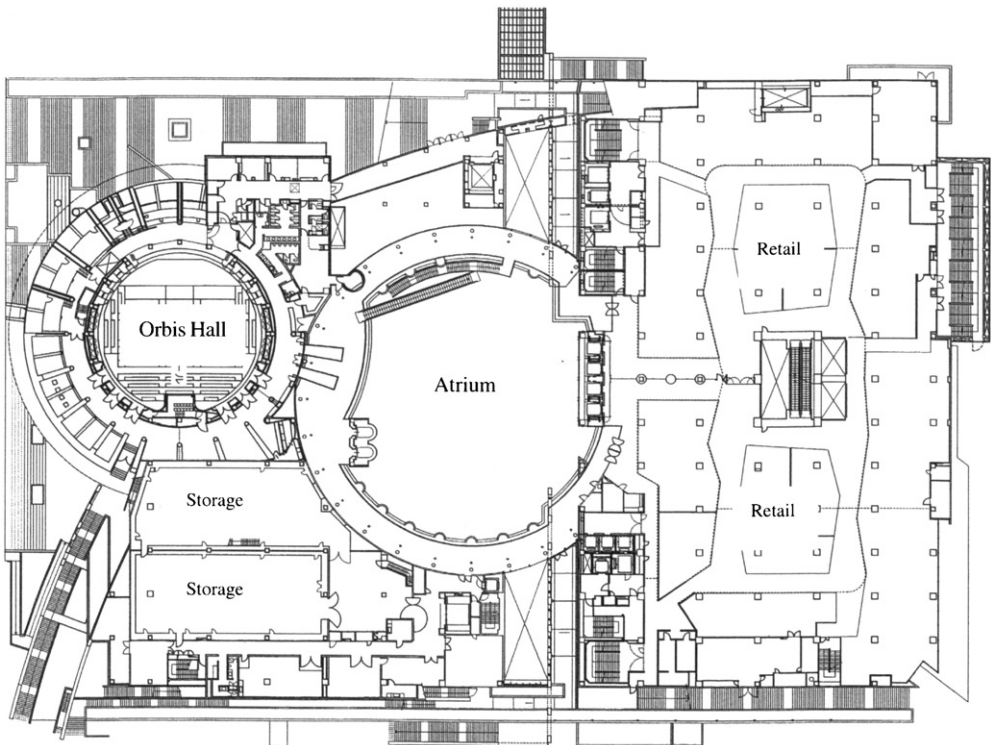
Plan of fifth floor of Kobe Fashion Plaza.
